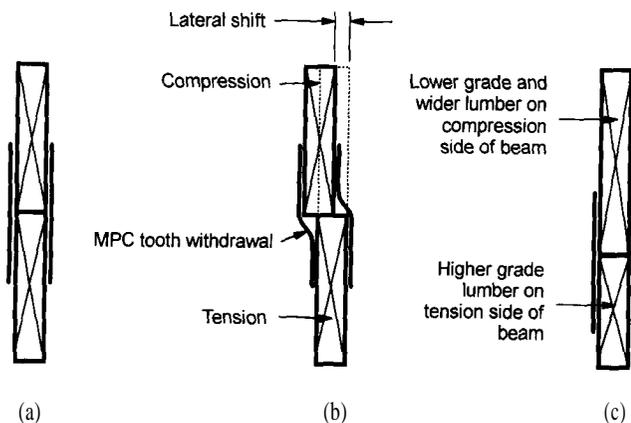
Stacked beams with identically sized members and insufficient lateral bracing: (a) unloaded, and (b) under high bending load. (c) Stacked beam designed to minimize cost and lateral shifting.
